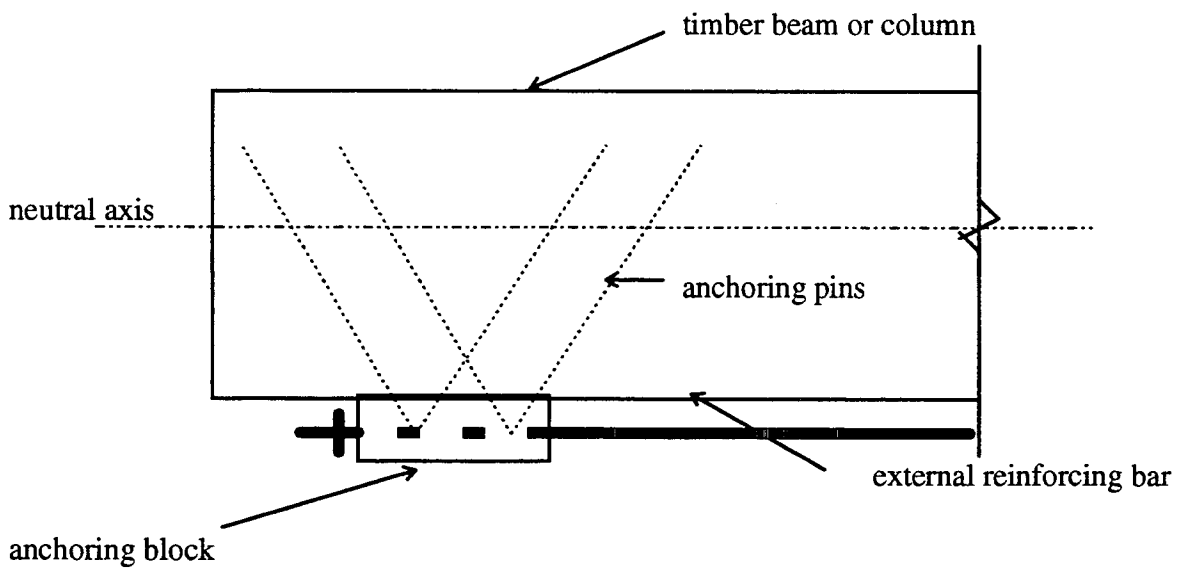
Turkovsky Reinforcing Anchor Bracket
